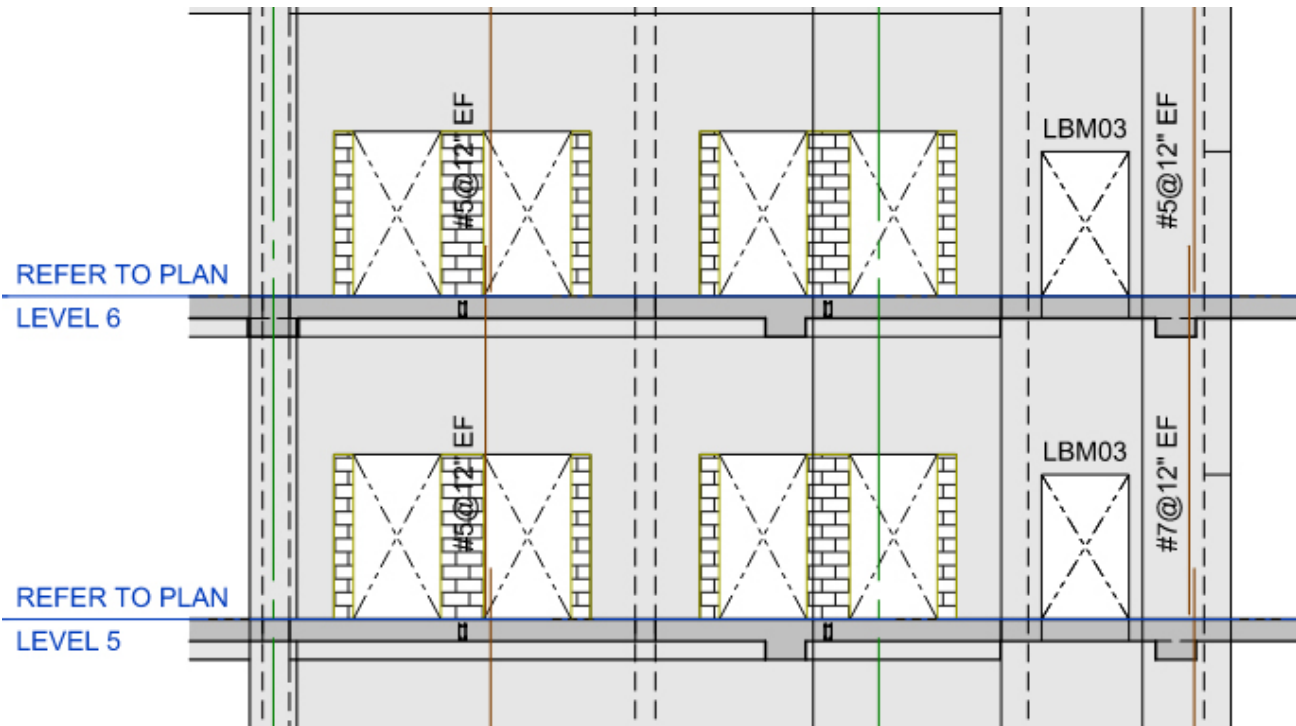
Concrete masonry units can be used to create multiple openings from one large blockout in a concrete wall. Note that replacement of multiple small openings with fewer larger openings will require coordination of structural and architectural plans. (Image courtesy of Ceco Concrete Construction.)
